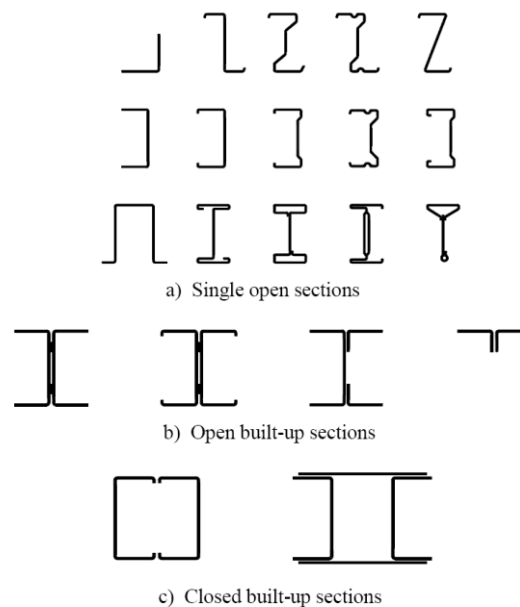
1: Typical sectional members formed by cold-forming [2]
